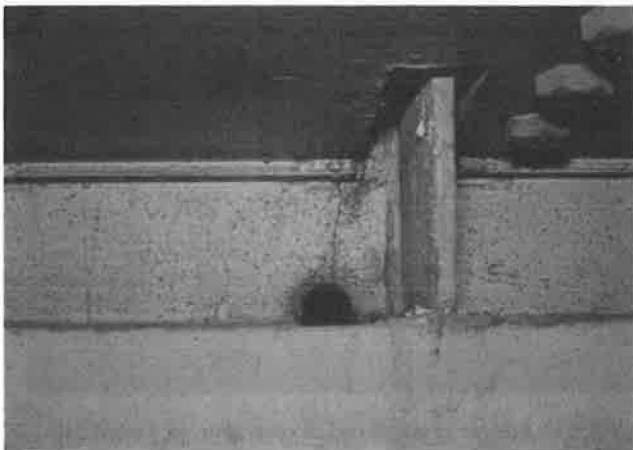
Fatigue crack at web gusset weld termination.
